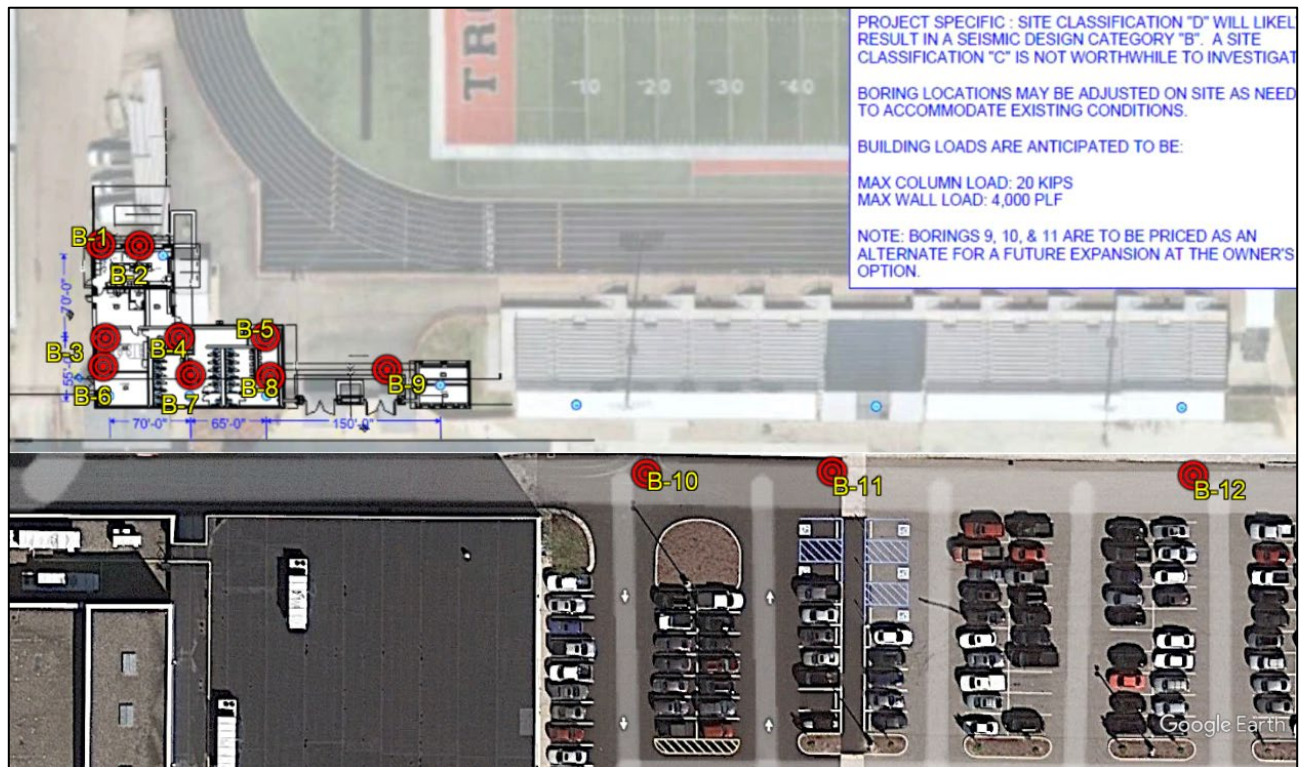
Boring Locations Over Existing Conditions and Preliminary Site Plan
